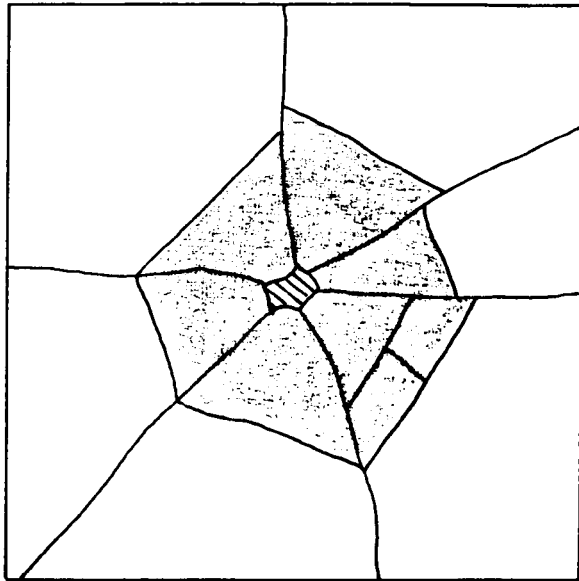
CRACKS FORMED IN AN UNREINFORCED SAND/GRAVEL CONCRETE SLAB BY A 16g SUBSURFACE EXPLOSIVE CHARGE IN CLAY
